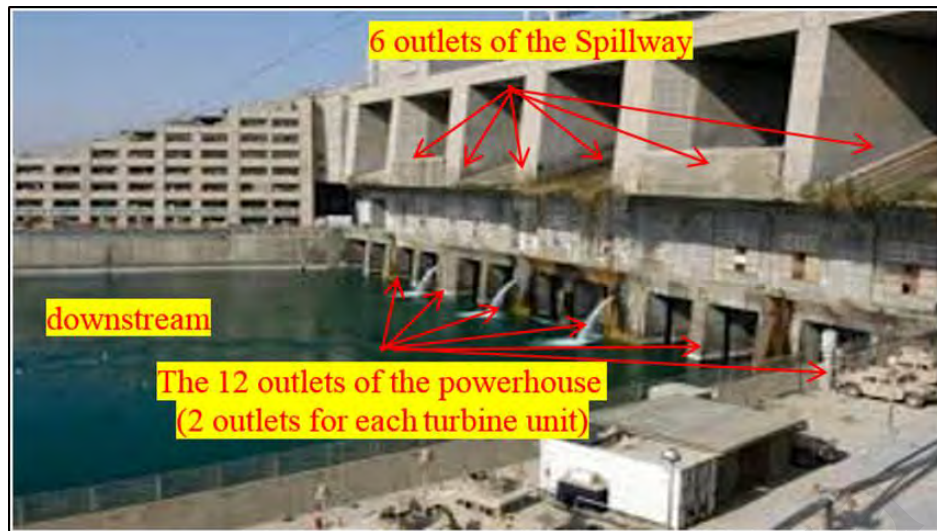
Downstream of Haditha dam with spillway and outlet of powerhouse
